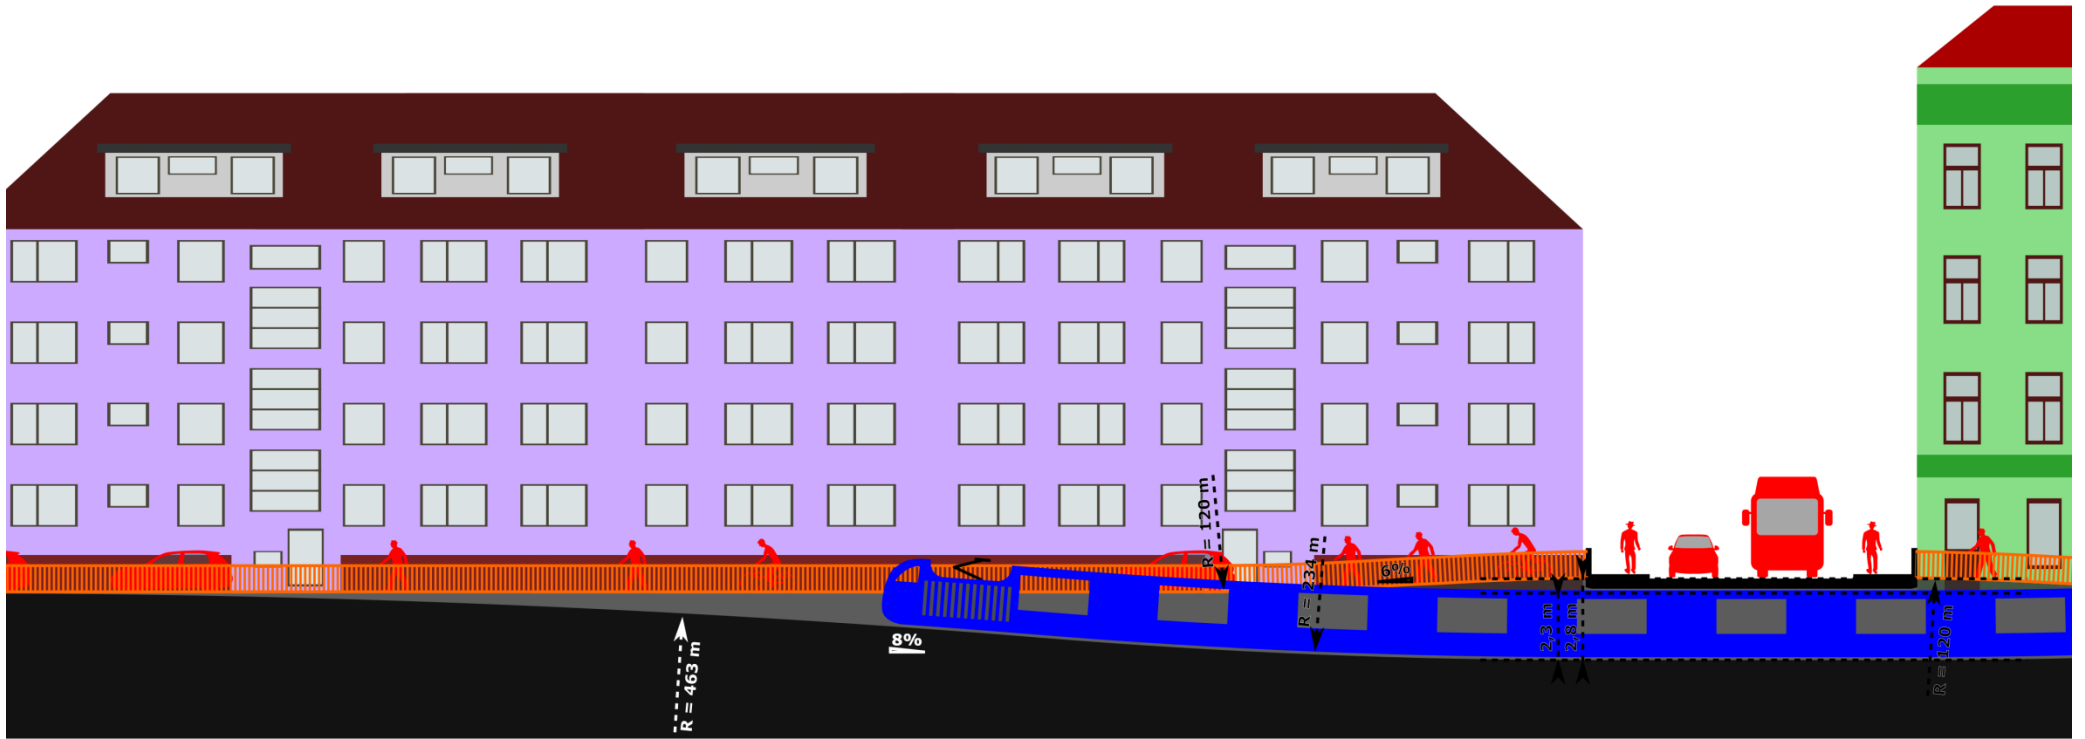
Detailed ground plan of an LCRT line with a deep underpass
